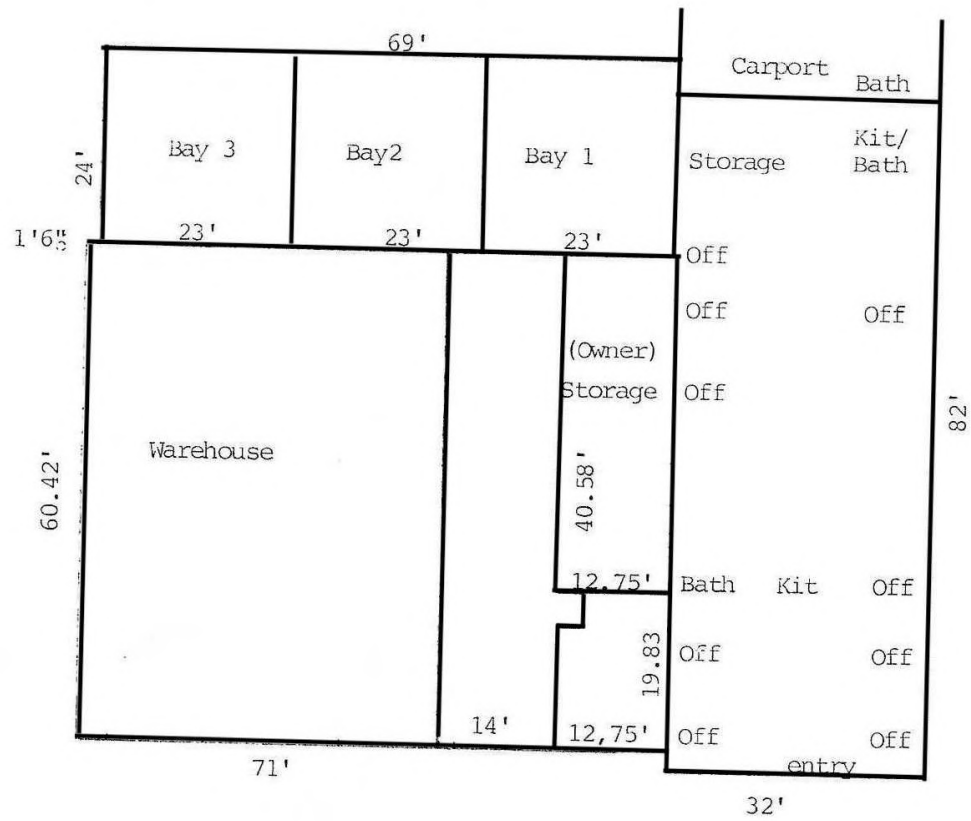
1073 BUILDING FLOOR PLAN
